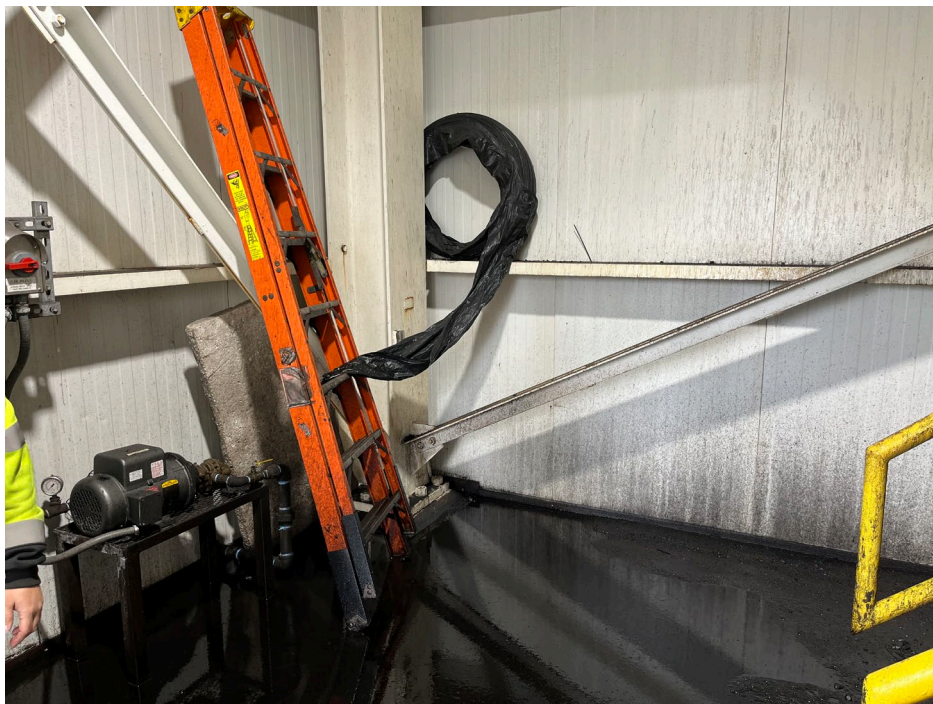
Inside of the stoker loadout facility, building will be sealed in the spring season to prevent seepage. Facility drainage will be directed to the adjacent pump house.
